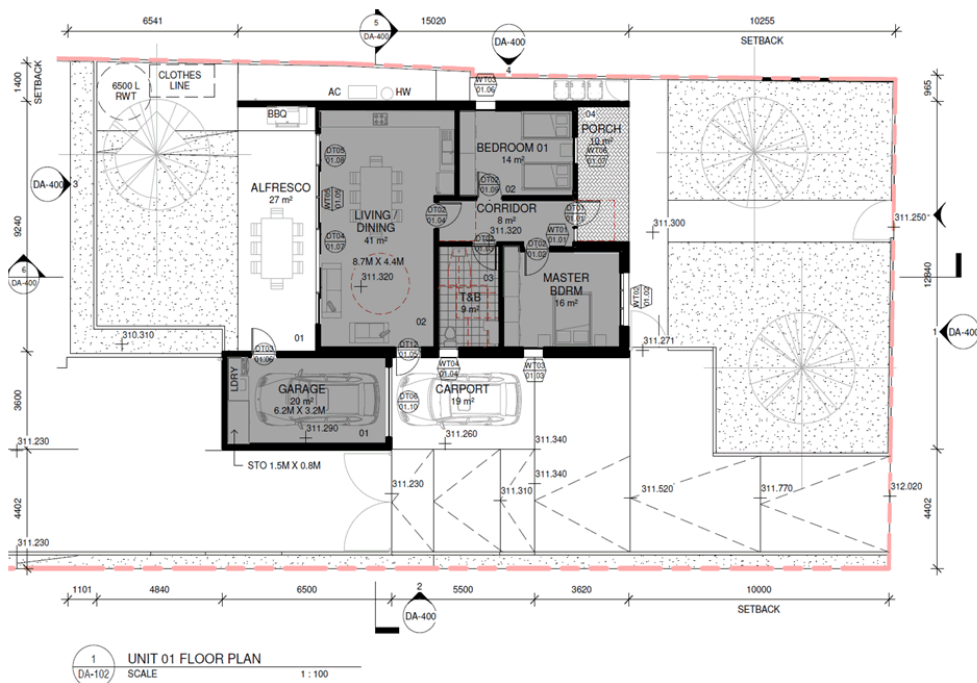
Unit 01 (facing Cummins Street) Floor Plan showing a modest footprint and green front yard that will positively contribute to the streetscape. The front setback is a generous 10m to the master bedroom, and 12m to the entry/ bedroom 01. The garage has a separate roof from the main building and is set as far back as possible.
